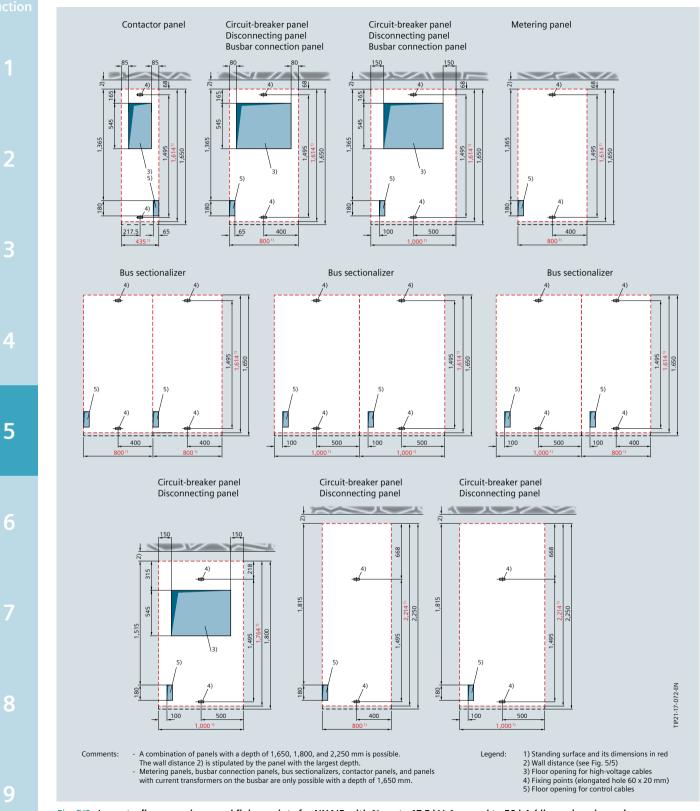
/9: Layouts, floor openings, and fixing points for NXAIR with U_r up to 17.5 kV, I_{sc} equal to 50 kA (dimensions in mm)
